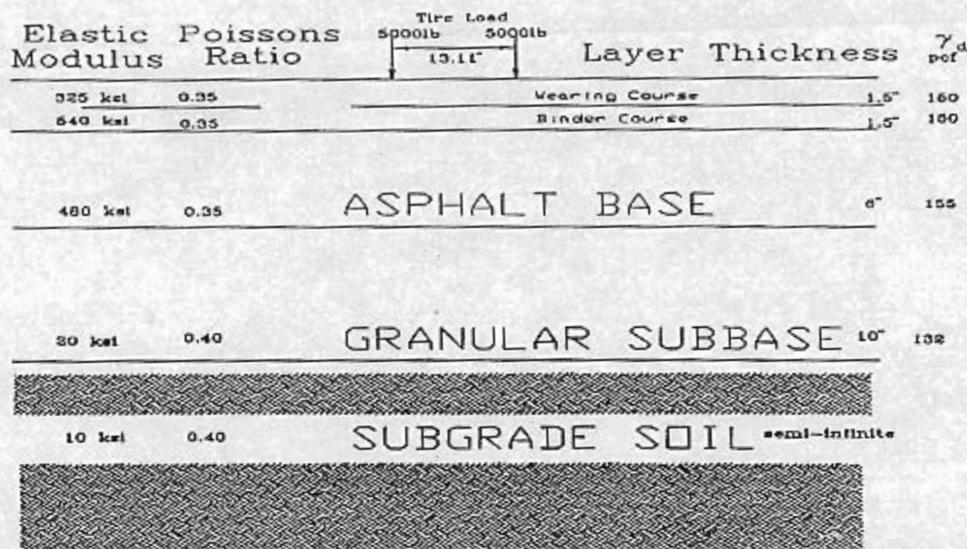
Typical Cross Section of Pavement Structure for the State of Connecticut
